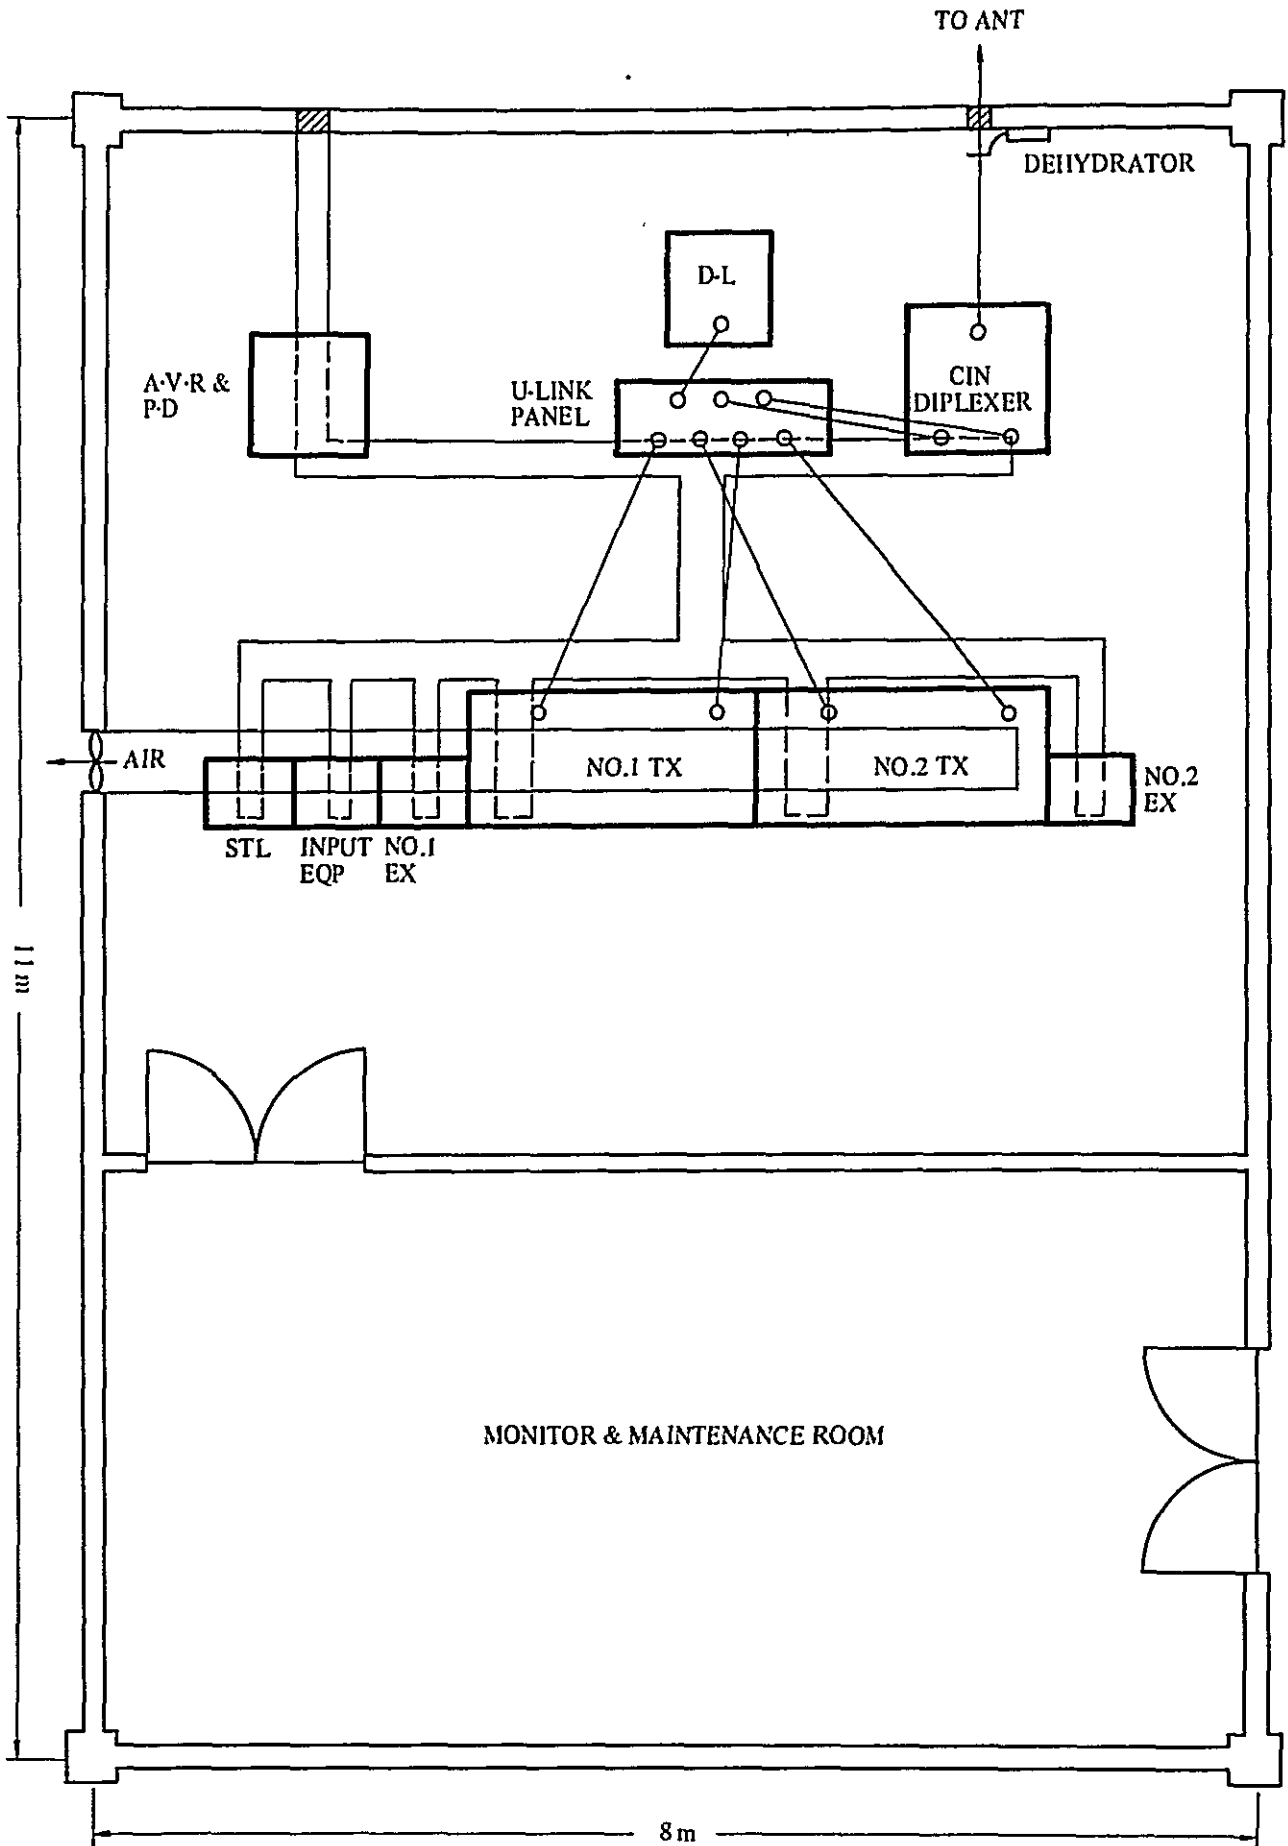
Floor Layout of VHF 10kW TV Transmitting Station
